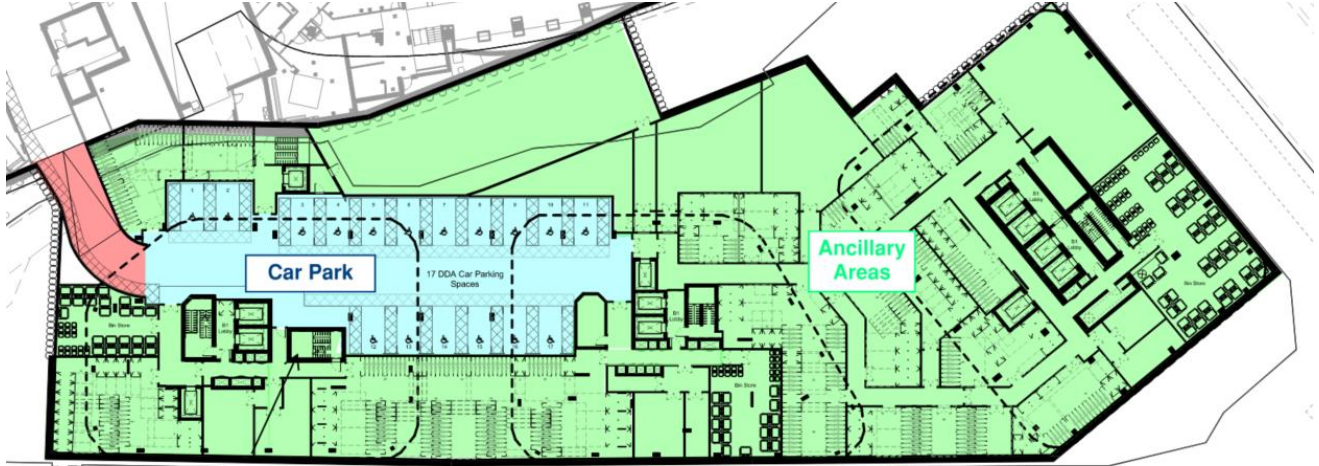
Figure 6 below highlight these areas. Basement 1 will be provided with four escape stairs and basement 2 will be provided with two escape stairs.
